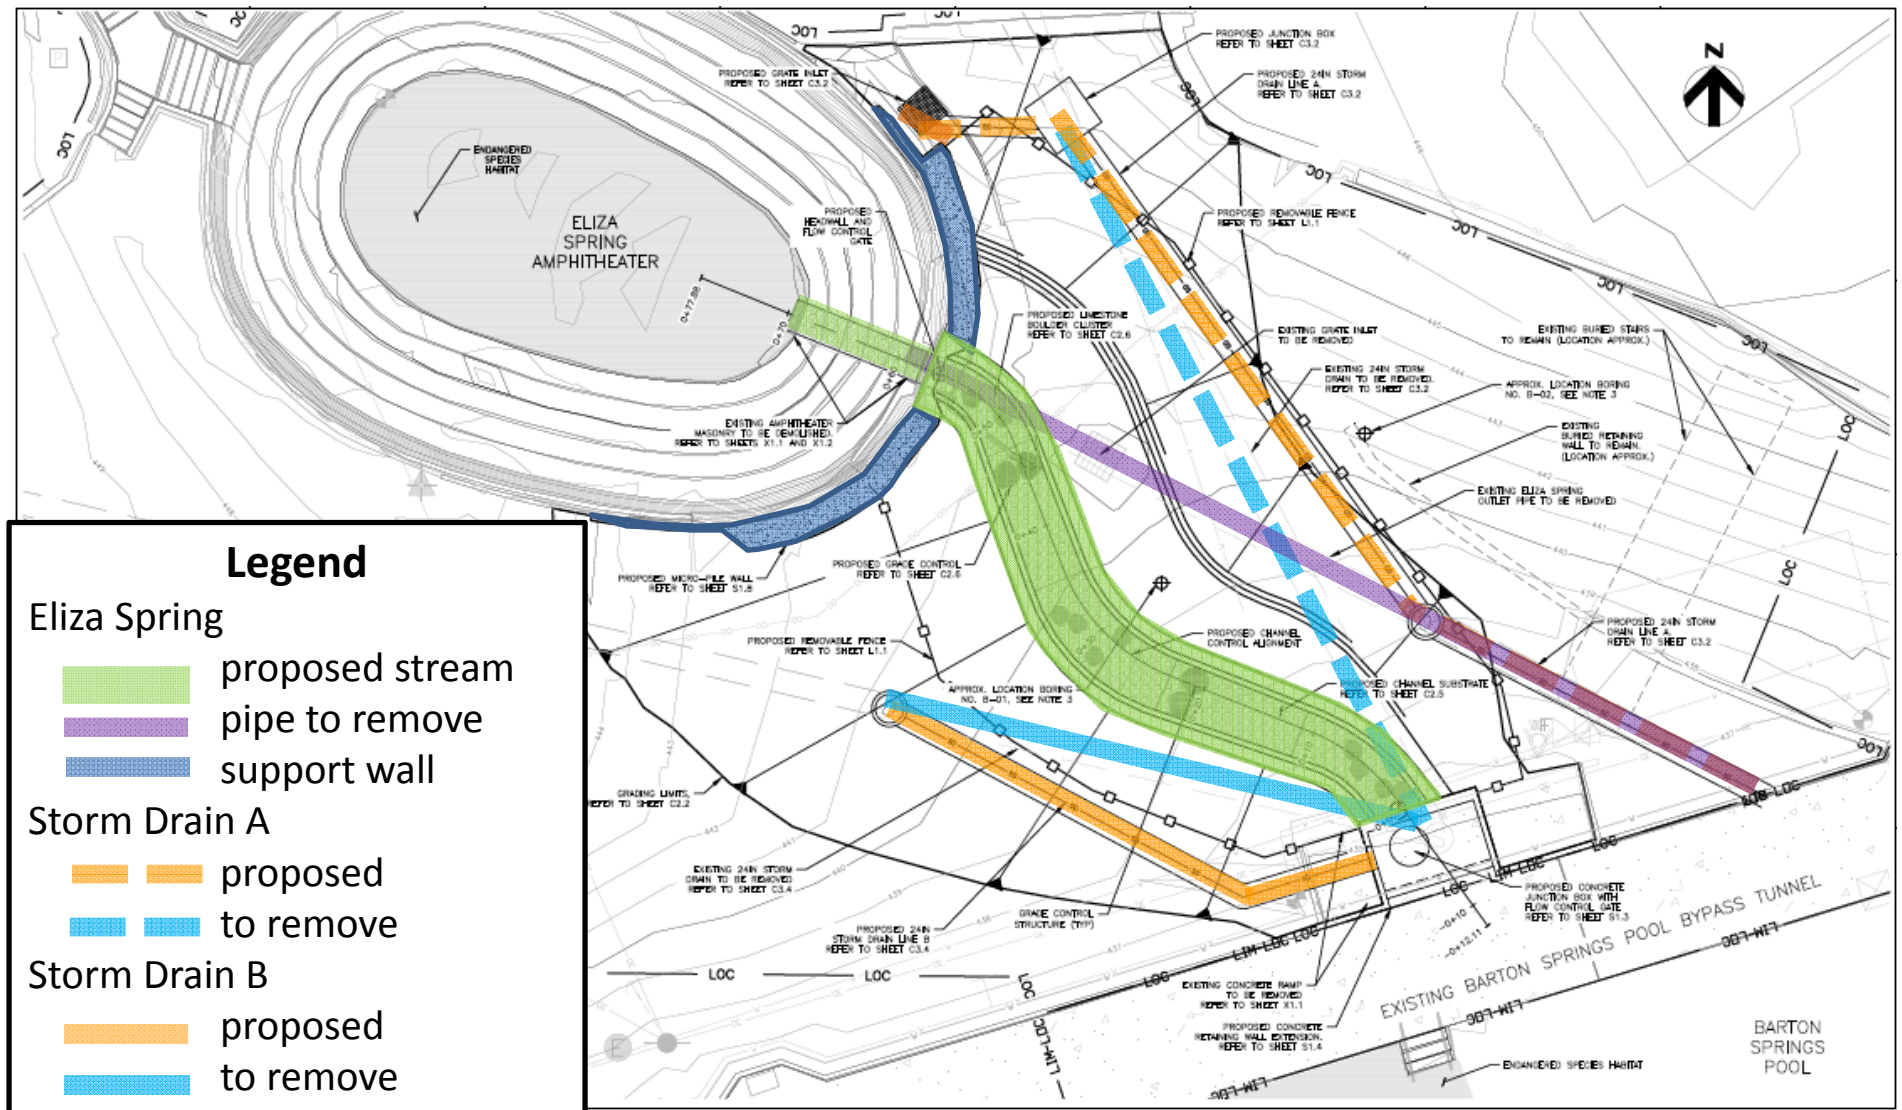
Exhibit B: New Channel, Storm Drain Redirection, and Structural Support
